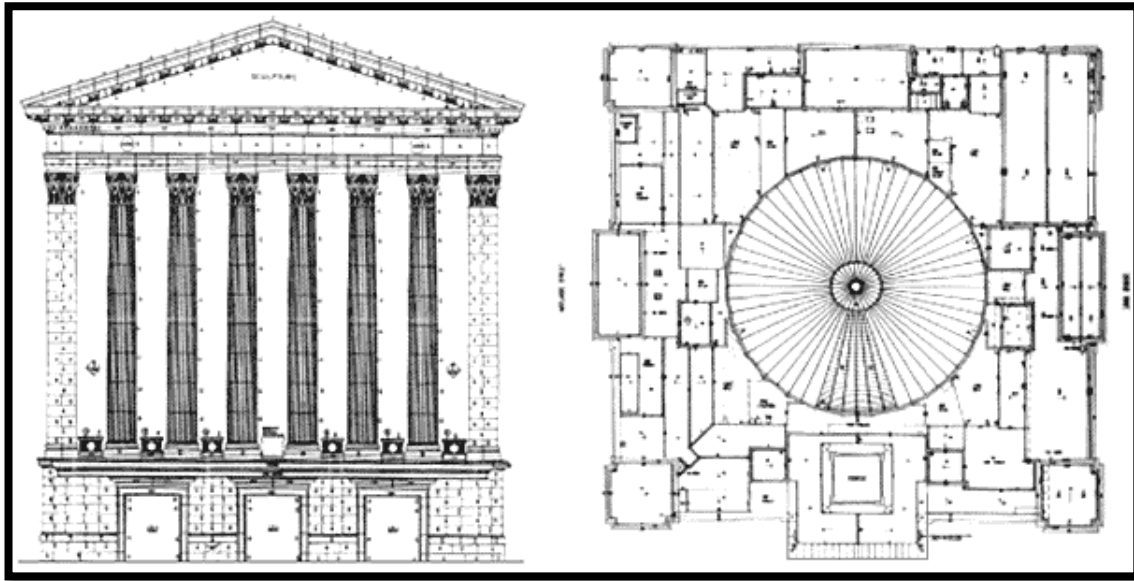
Front Elevation and Plan of Brisbane City Hall (Source:ARCHITECTUREAU)
